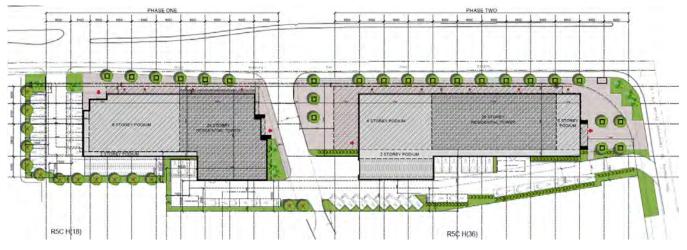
Excerpt from Proposed Site Plan. Phase One is at the Left.
